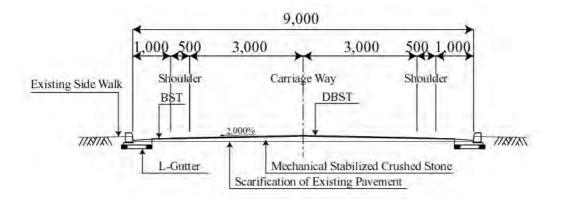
Standard Cross-Section: South Tarawa Road in Betio (1)
